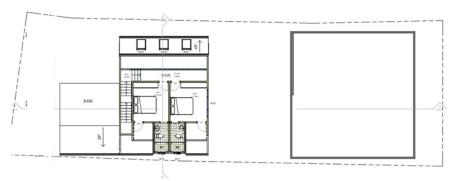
Upper Floor Plan (BeeHive Design, 2021)
